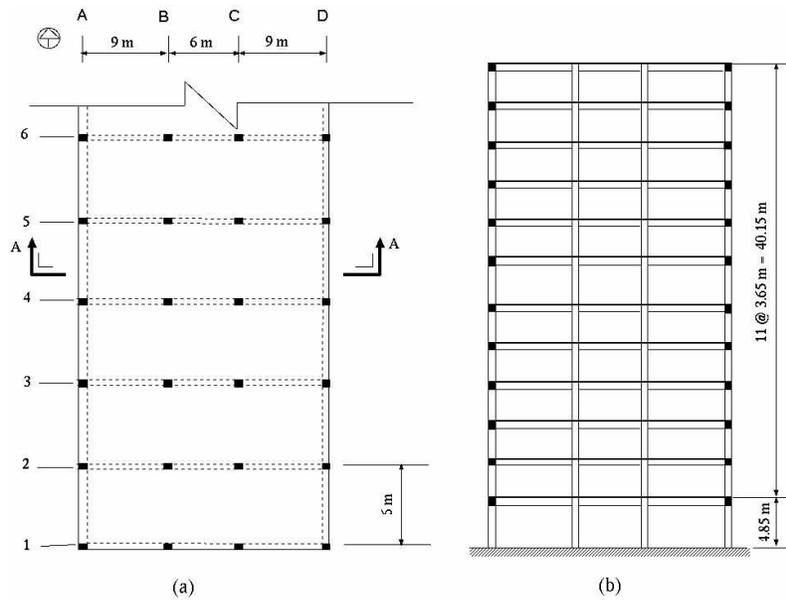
Layout of the building with moment resisting frames, (a) plan, and (b) elevation
